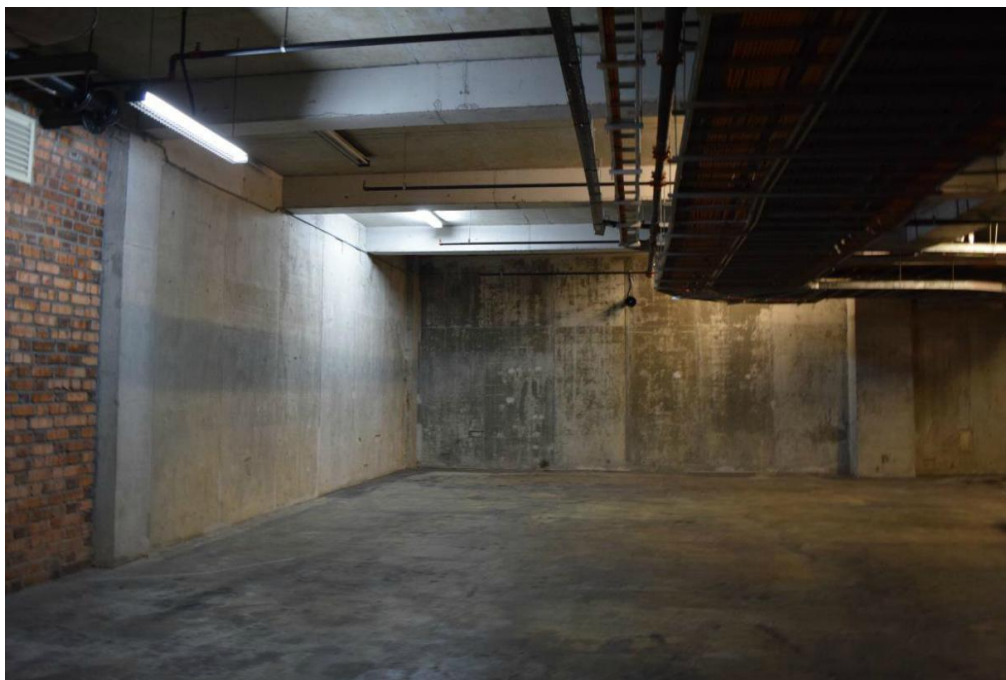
Fair-faced concrete finish on some interior walls at PJ Trade Centre
